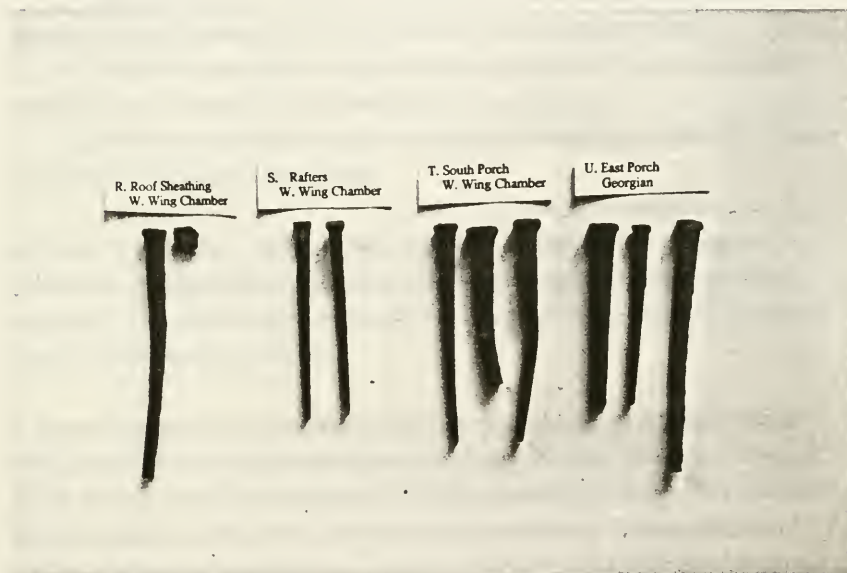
Nails of Rear Porch Structures and Federal West Chamber Roof
